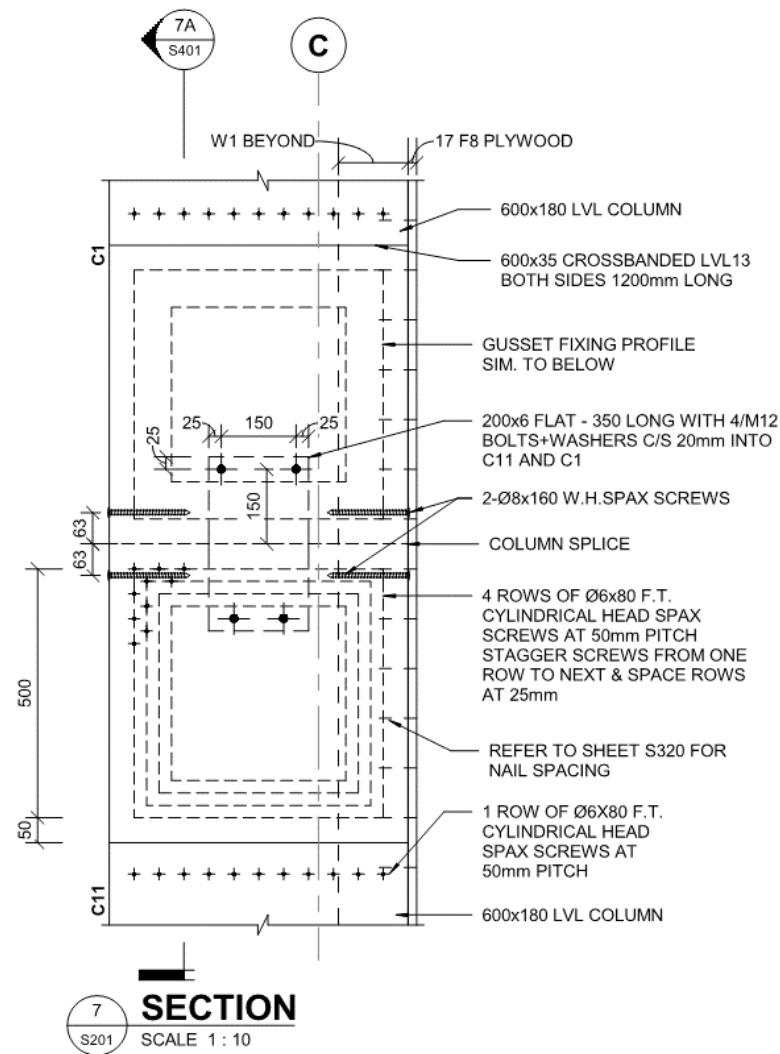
Mid height splice connection detail for 600x270 portal column
